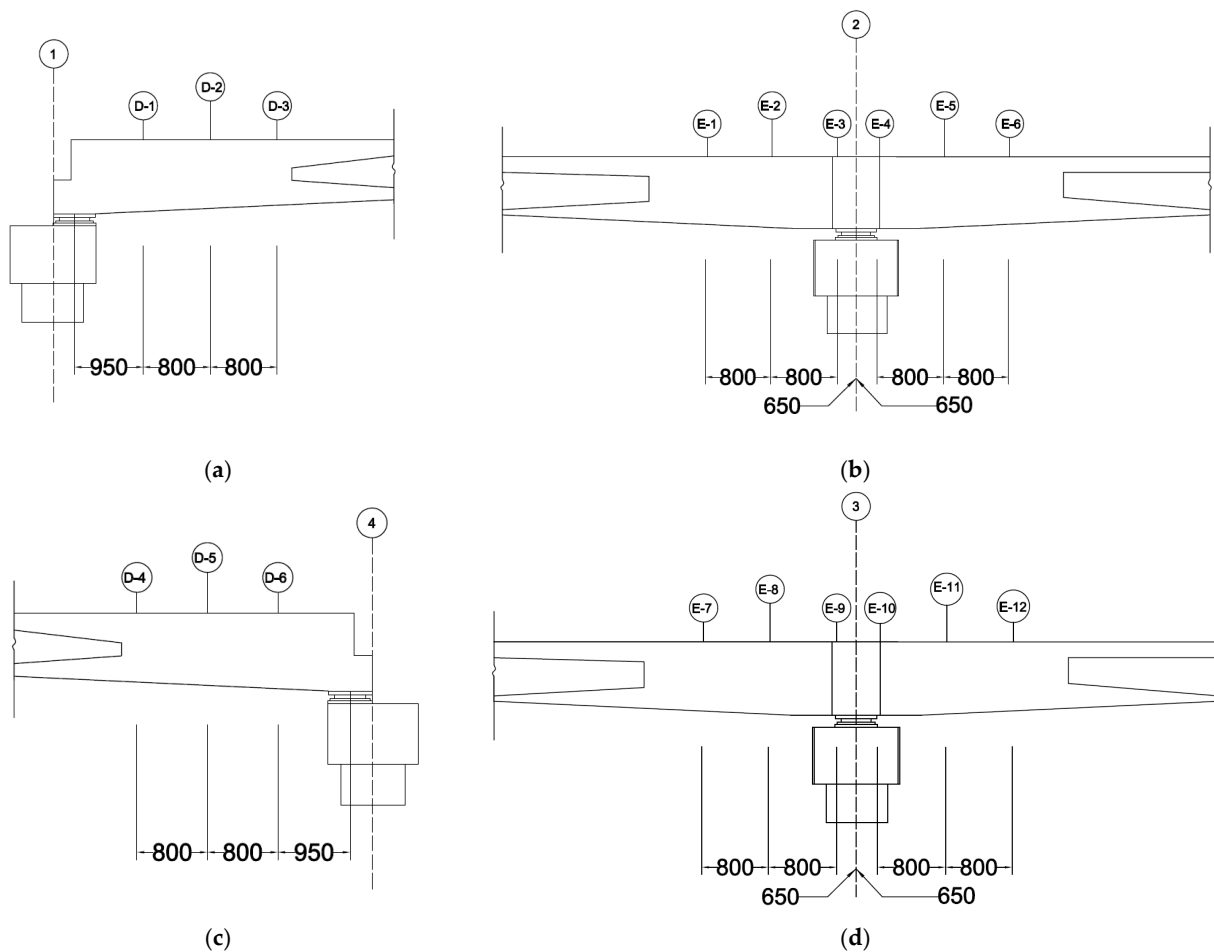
Details of end sections at locations (a) A-1, (b) A-2, (c) A-3 and (d) A-4 (units: mm).
